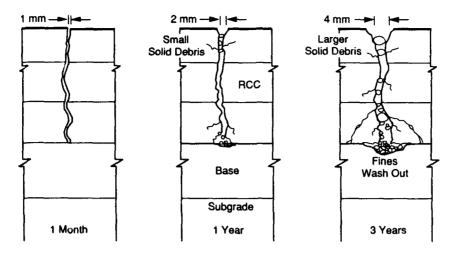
Typical shrinkage crack progression during the first three years of pavement service.
